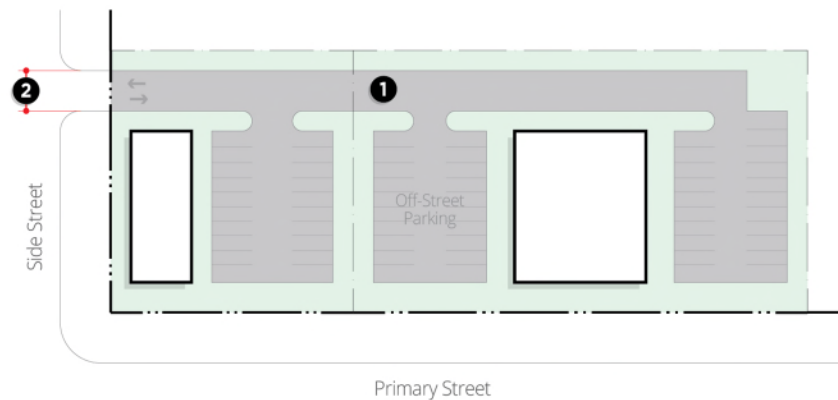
Parking Stall and Aisle Dimensional Standards
